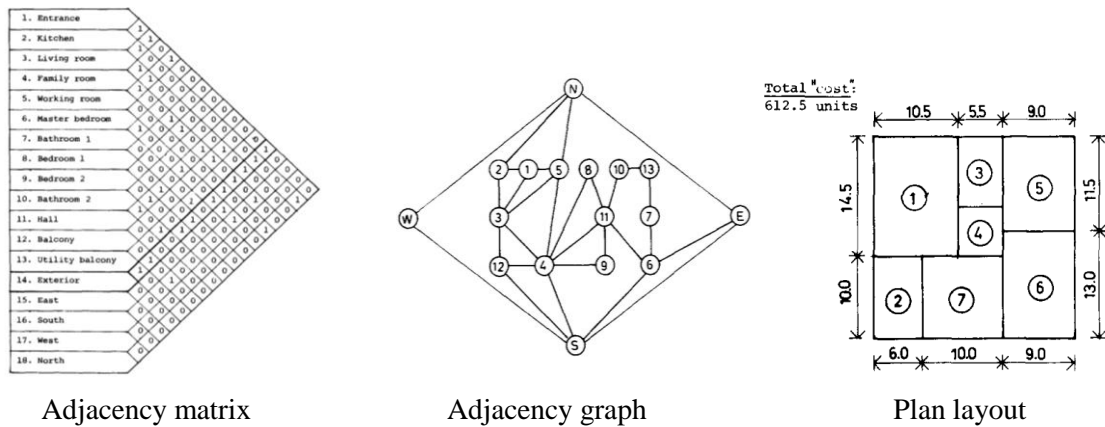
adjacency matrix to dimensioned floor plan layout (Roth et al., 1982)
